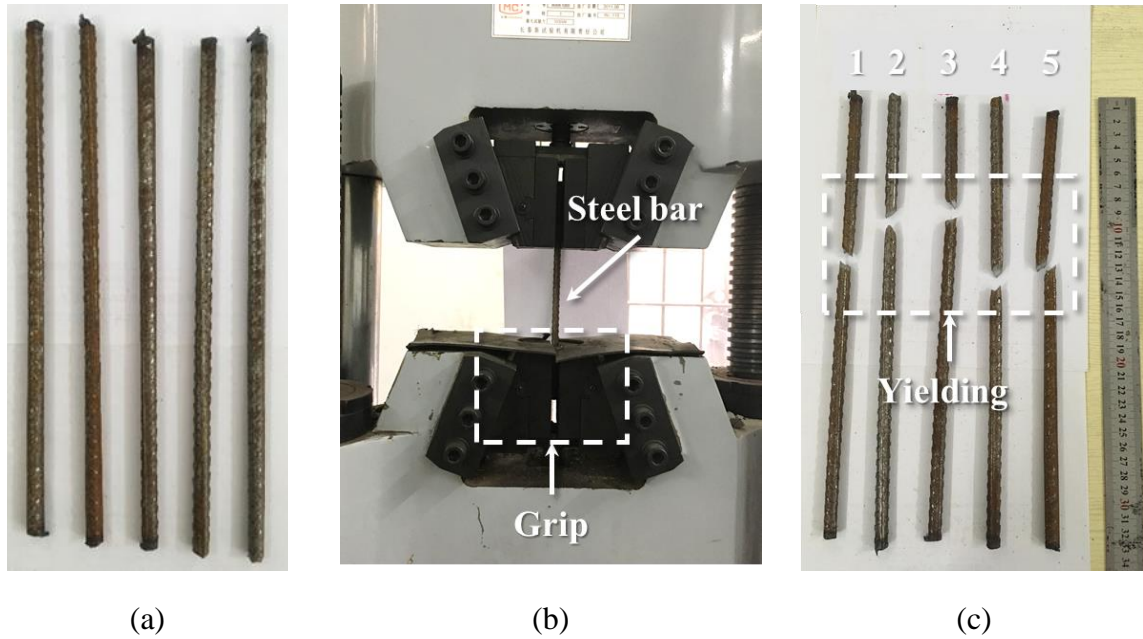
Tensile test of steel bars: (a) steel bar specimens; (b) tensile test setup; (c) steel bars after failure.
